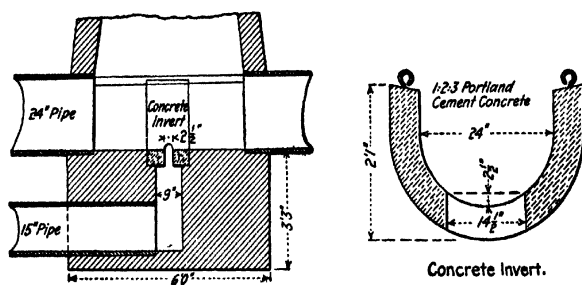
Leaping weir for pipe sewers, Cleveland.
